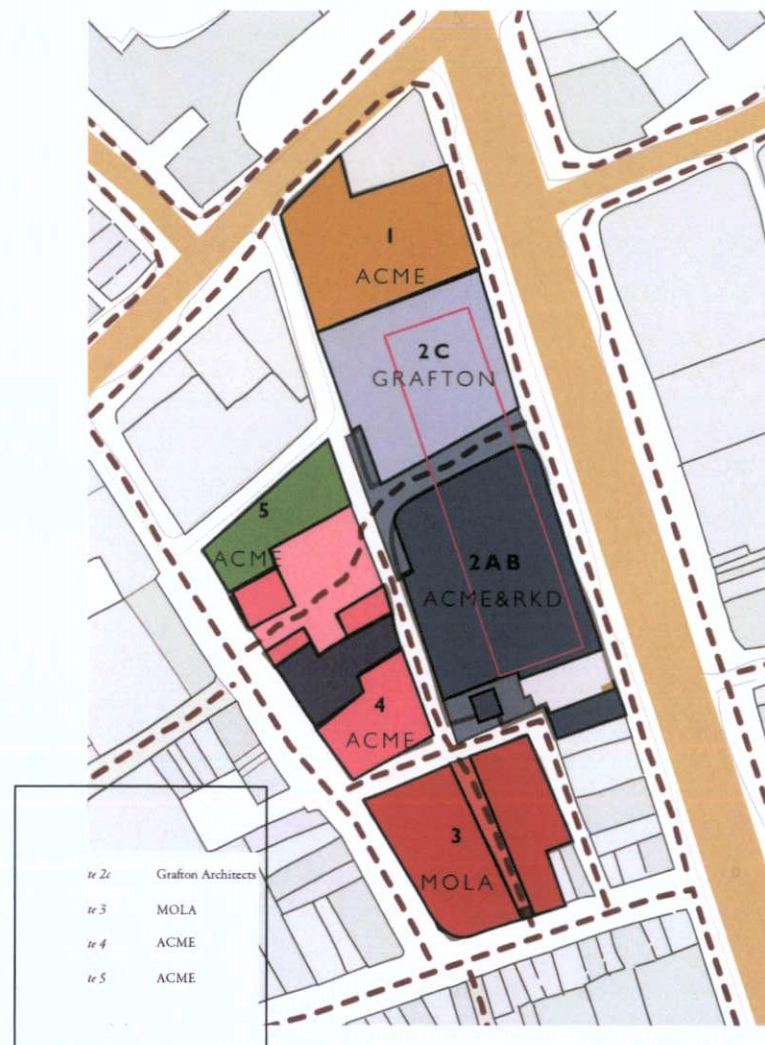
The Proposed Development (Site 3, Site 4 and Site 5) shown within the context of the Dublin Central Masterplan.
